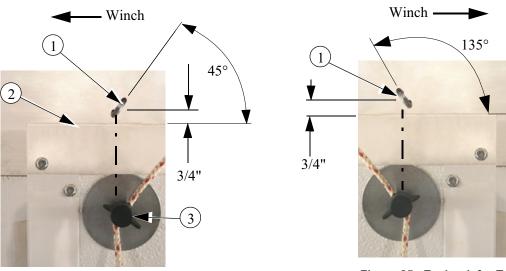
Eyehook for Tunnel Doors with Winch to the right
